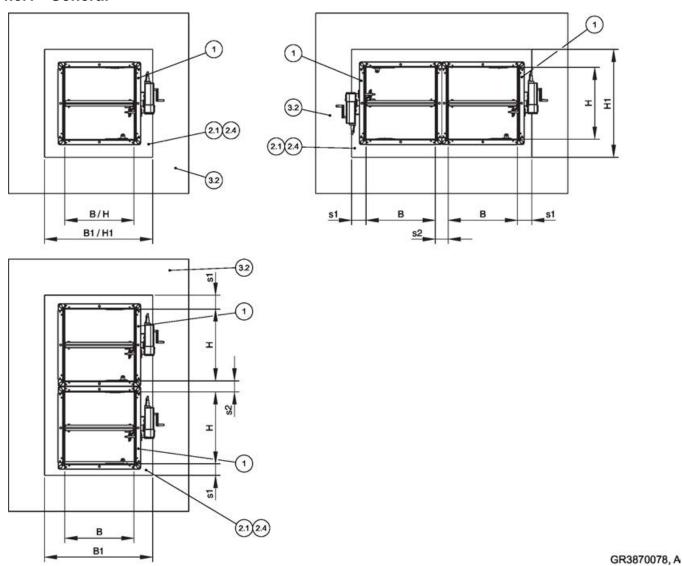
Lightweight partition walls with metal support structure – arrangement/distances
